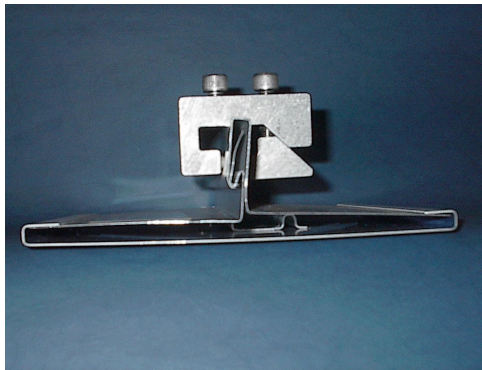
shows the ACECLAMP™ as secured to a typical standing seam panel. The two additional socket-head hex screws have been loosely installed in the top of the clamp ready to attach the accessory.
